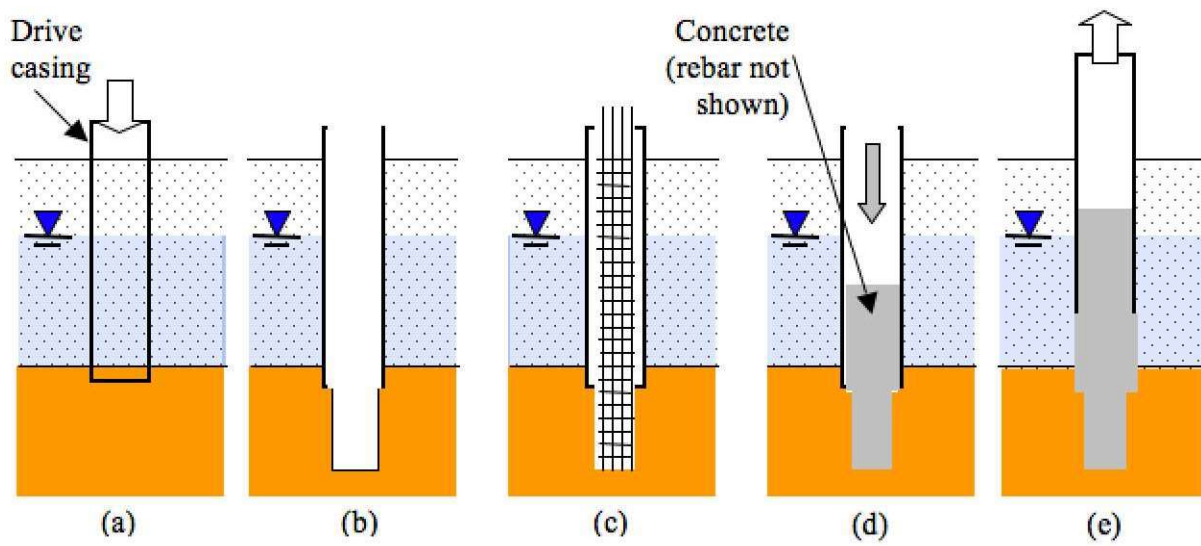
Construction Using Casing Advanced Ahead of Excavation: (a) drive casing into bearing stratum; (b) drill through casing; (c) complete and clean hole, set reinforcing; (d) place concrete to head greater than external water pressure; (e) pull casing while adding concrete
